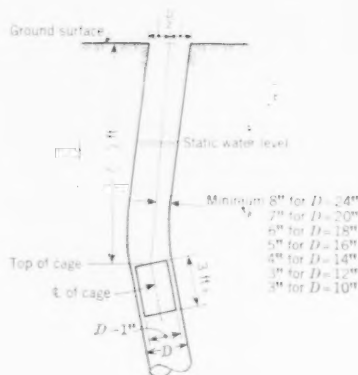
Well casing should be installed so that deflection from the vertical does not exceed 6 in. per 100 ft. At bends the pipe wall should not be closer than indicated to a line centered at top of casing, and held as shown.
